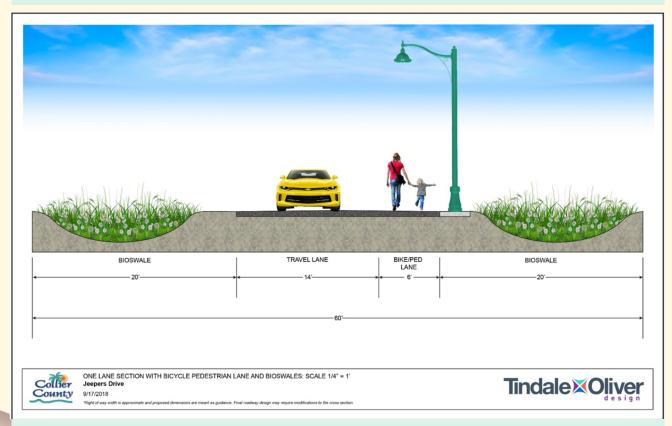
Potential Cross Section for Jeepers Dr
